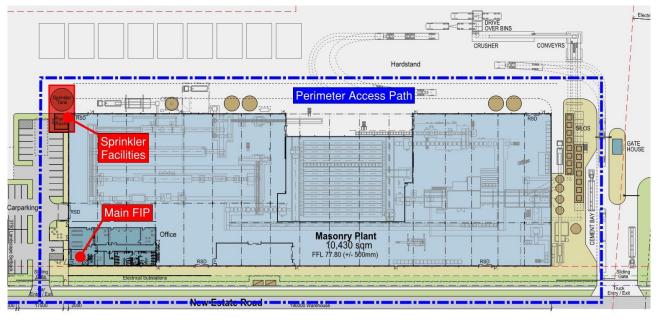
Fire Brigade Access and Site Facilities – Masonry Plant 1
